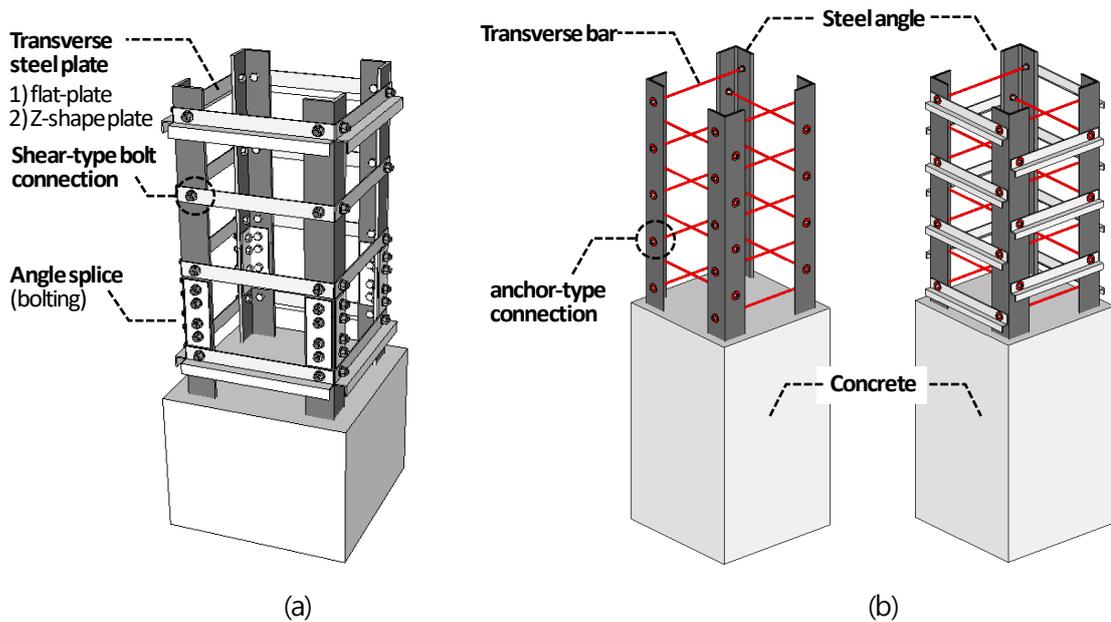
PSRC composite columns using (a) bolt-connected transverse steel plates and (b) anchor-type transverse bars
